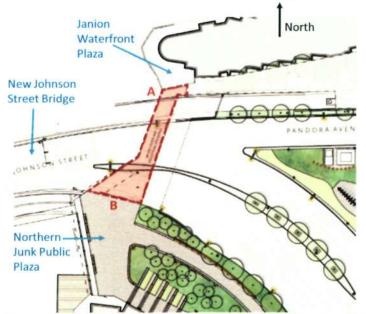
Proposed Johnson Street Bridge Underpass (red dashed area)
